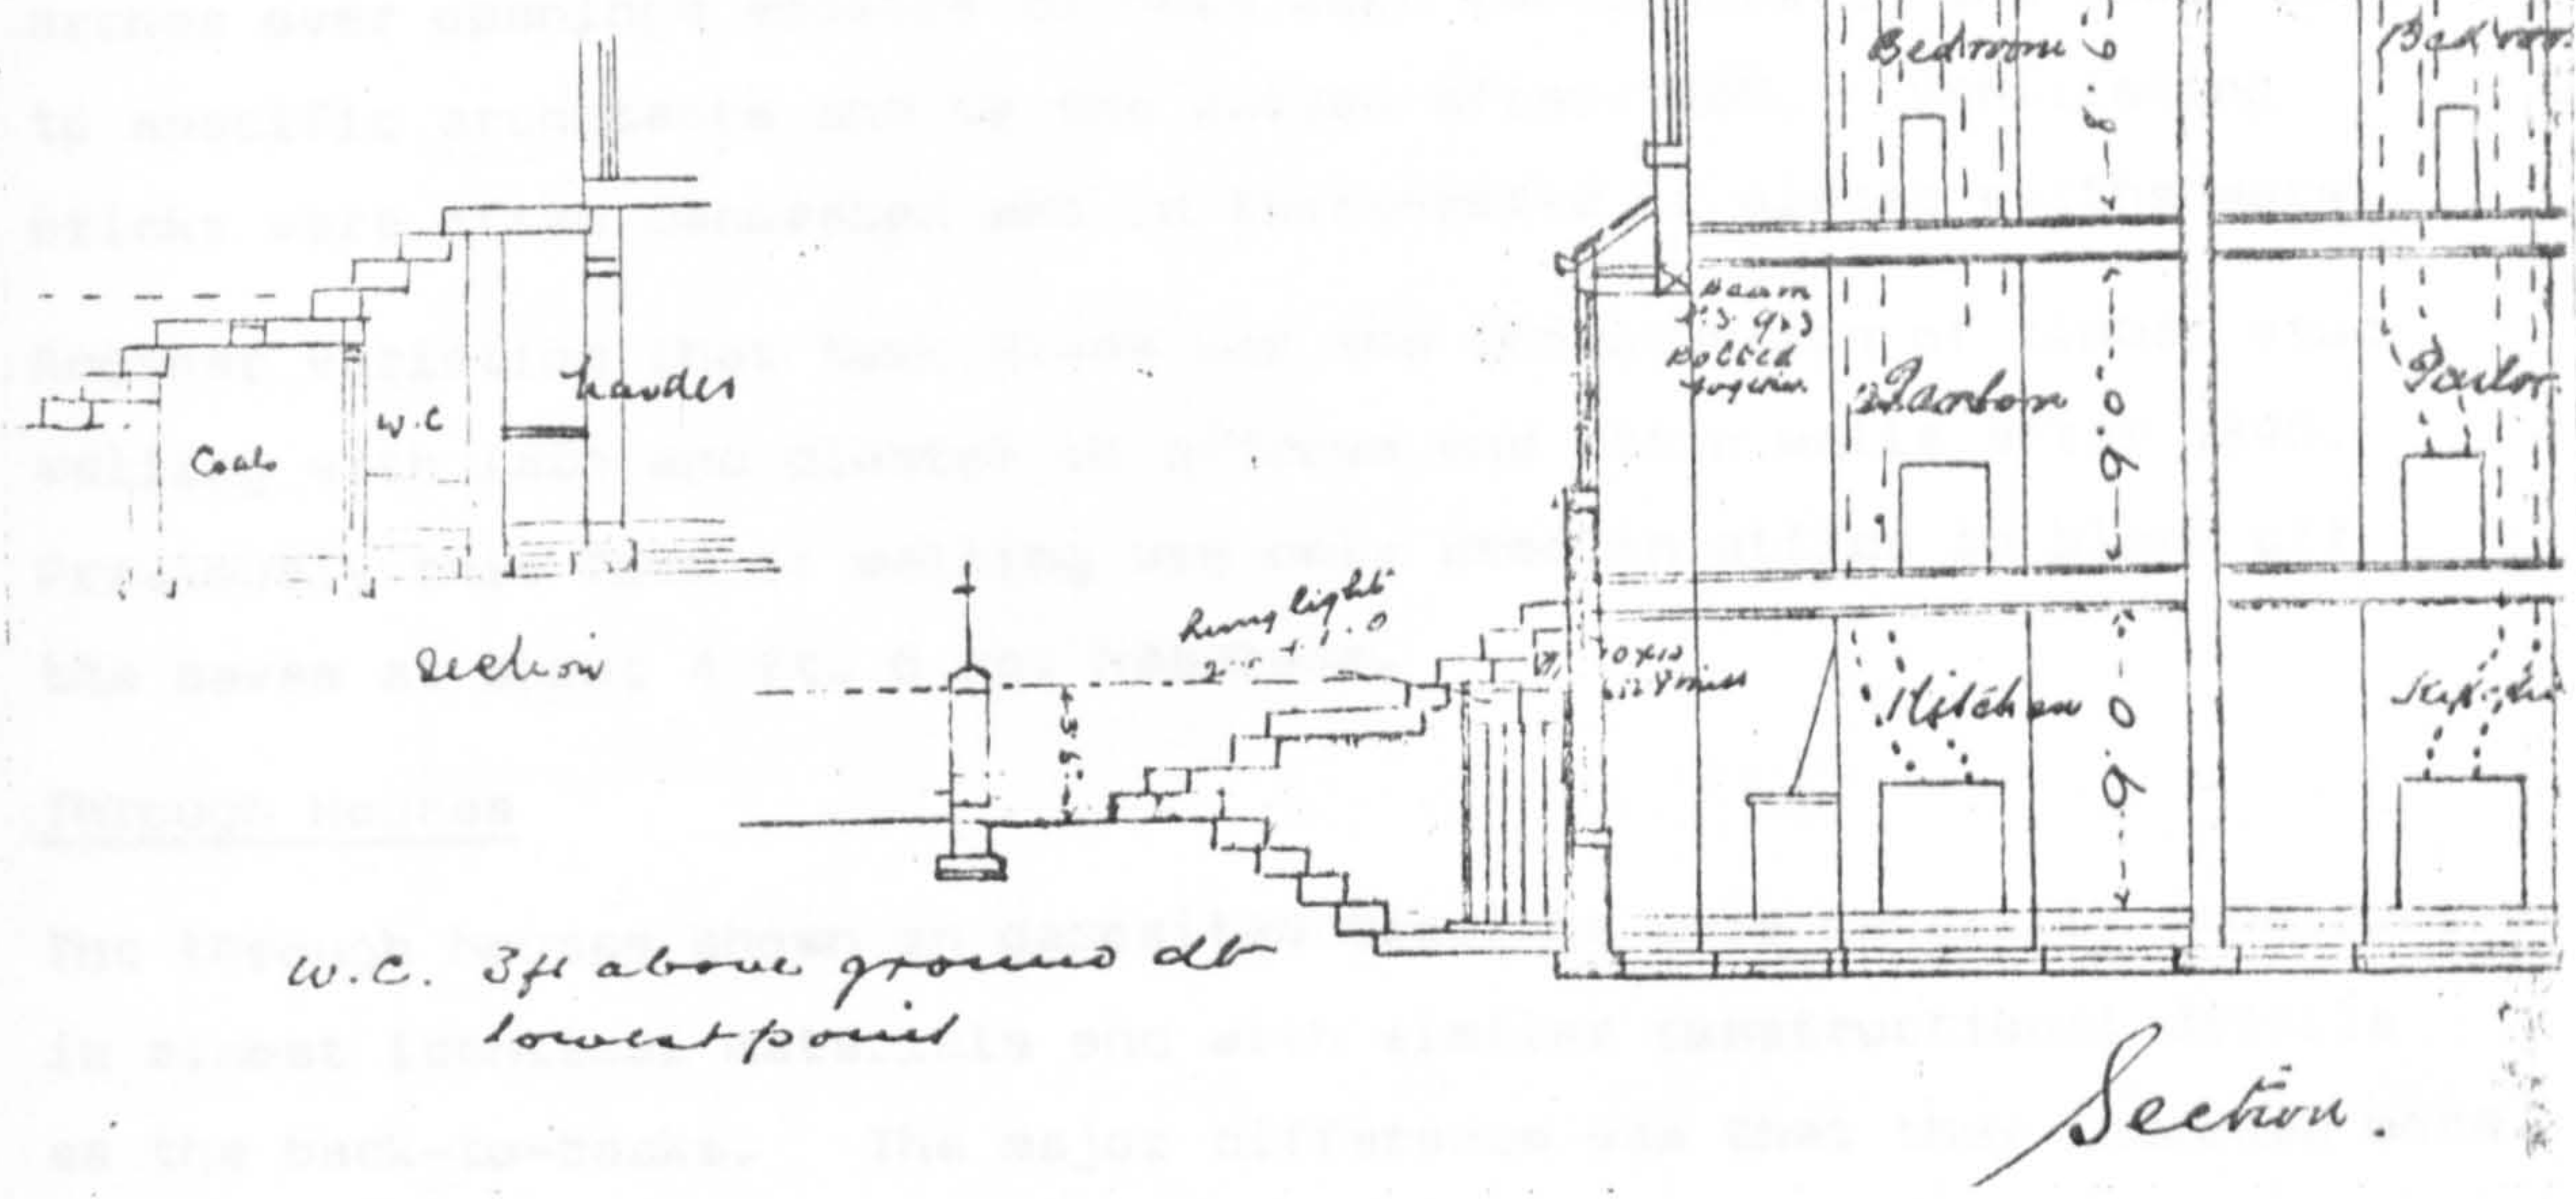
Section, back-to-back houses, showing water-closet positioned below entrance steps (W. Porrill 1888).
